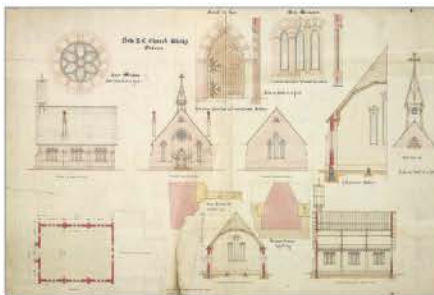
ST. JOHN THE EVANGELIST CATHOLIC CHURCH, WHITBY, ARCHITECTURAL DRAWING, GUNDRY AND LANGLEY, ARCHITECTS. | ARCHIVES OF ONTARIO, F4359, LANGLEY AND HOWLAND FONDS.
